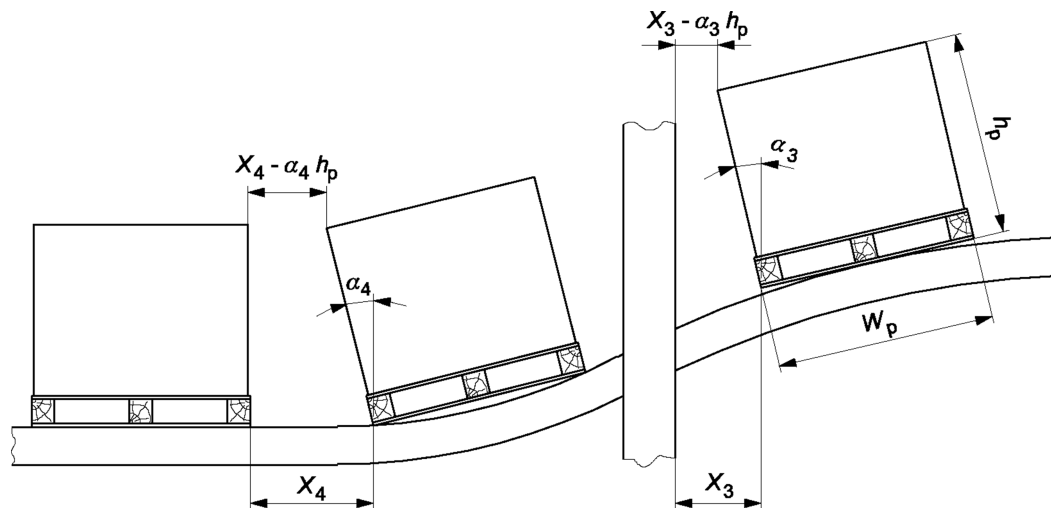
Mechanical handling equipment fork and unit load clearances over the rack beam
